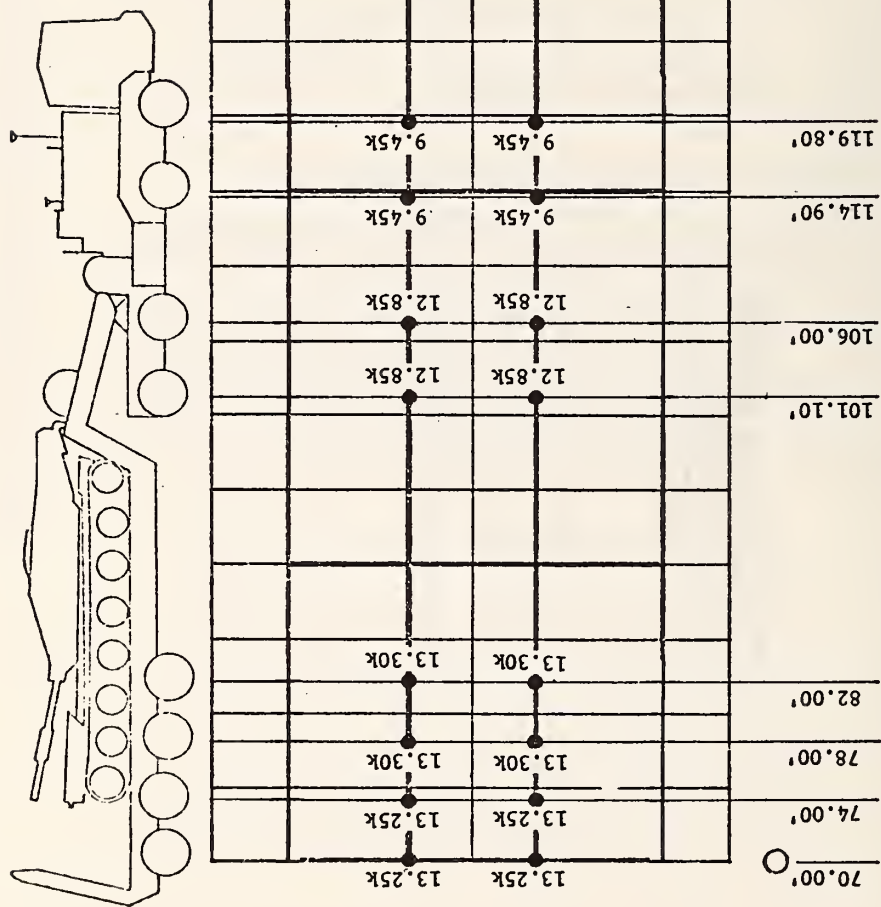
LOAD CONDITION 3, BRIDGE 1. REAR WHEEL OF TRAILER AT FIRST INTERIOR SUPPORT ON 90' SPAN.
